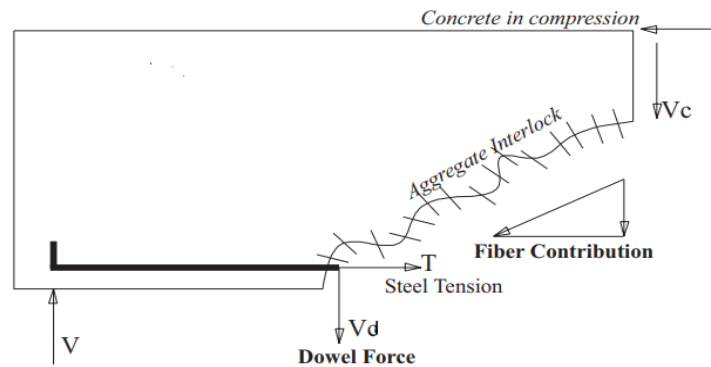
Mechanisms of Shear Transfer in a Cracked Beam Without Stirrups (Xia, et al., 2015).
